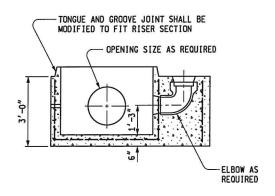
'-4" & 2'-0" TOP SECTIONS
